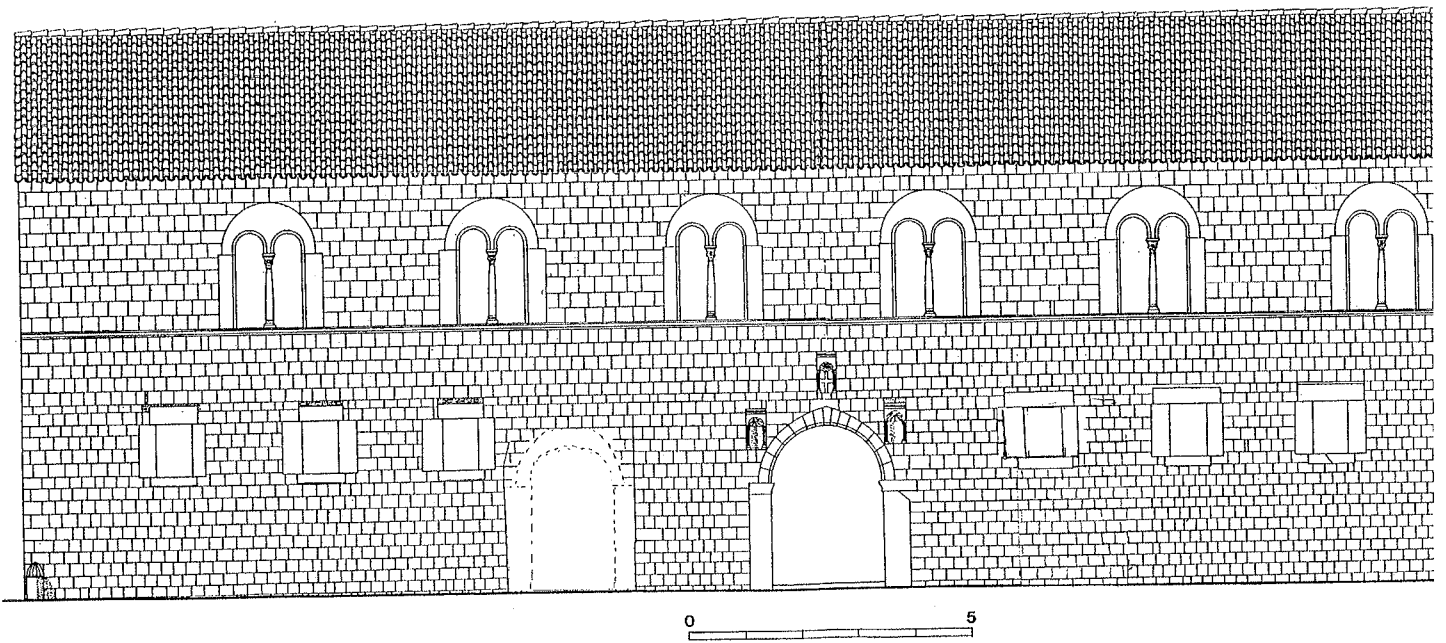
Poreč, Canon's house, facade, proposed reconstruction (R. Ivančević)
